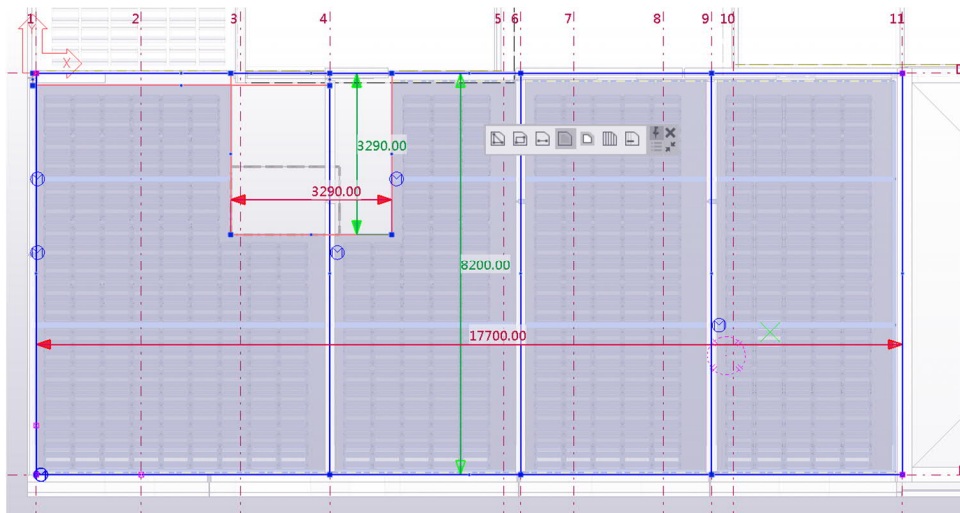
Floor layout component in the direct modification mode (Tekla Structures model snapshot)
